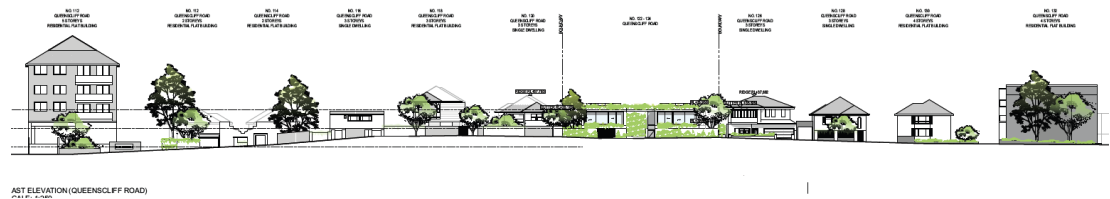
front elevation of the proposal within the local development pattern (source: architectural plan set, see full size Image within)
